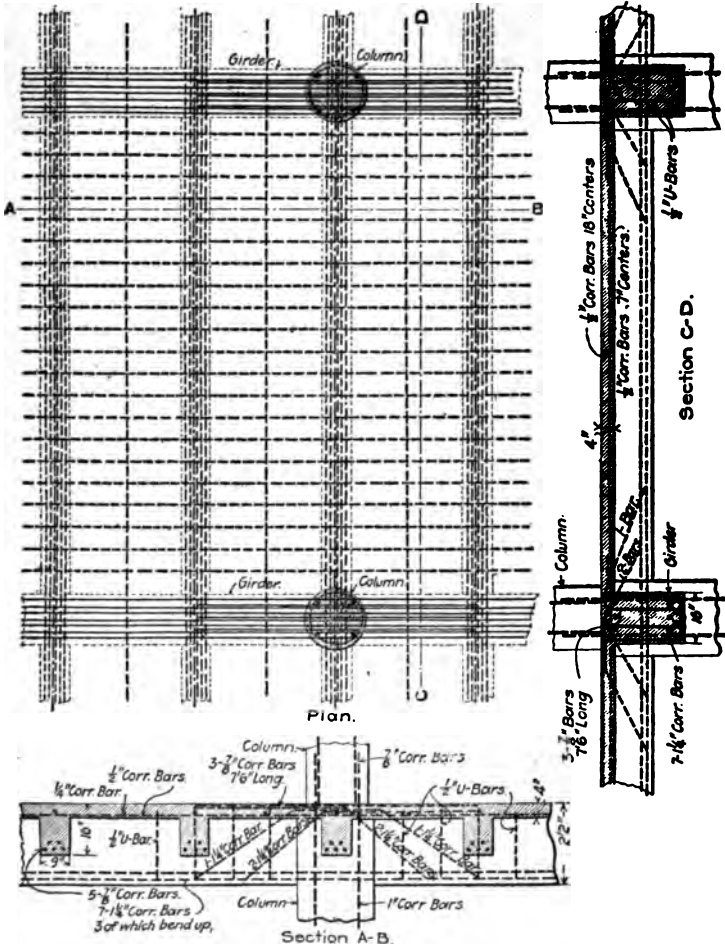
Floor Construction for Thompson & Norris Factory.
